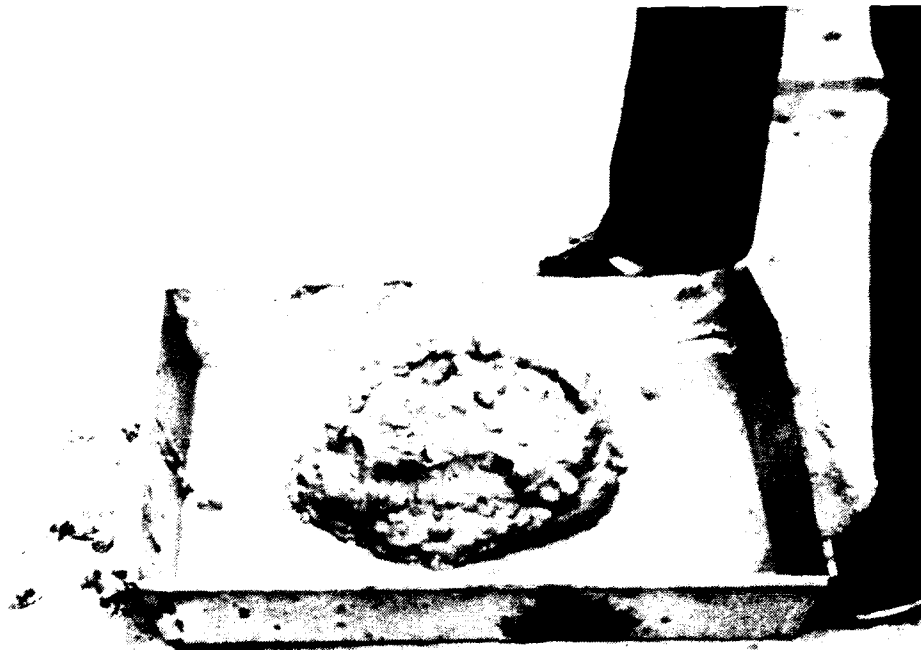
Slump of concrete immediately after pulling cone, trial 18
